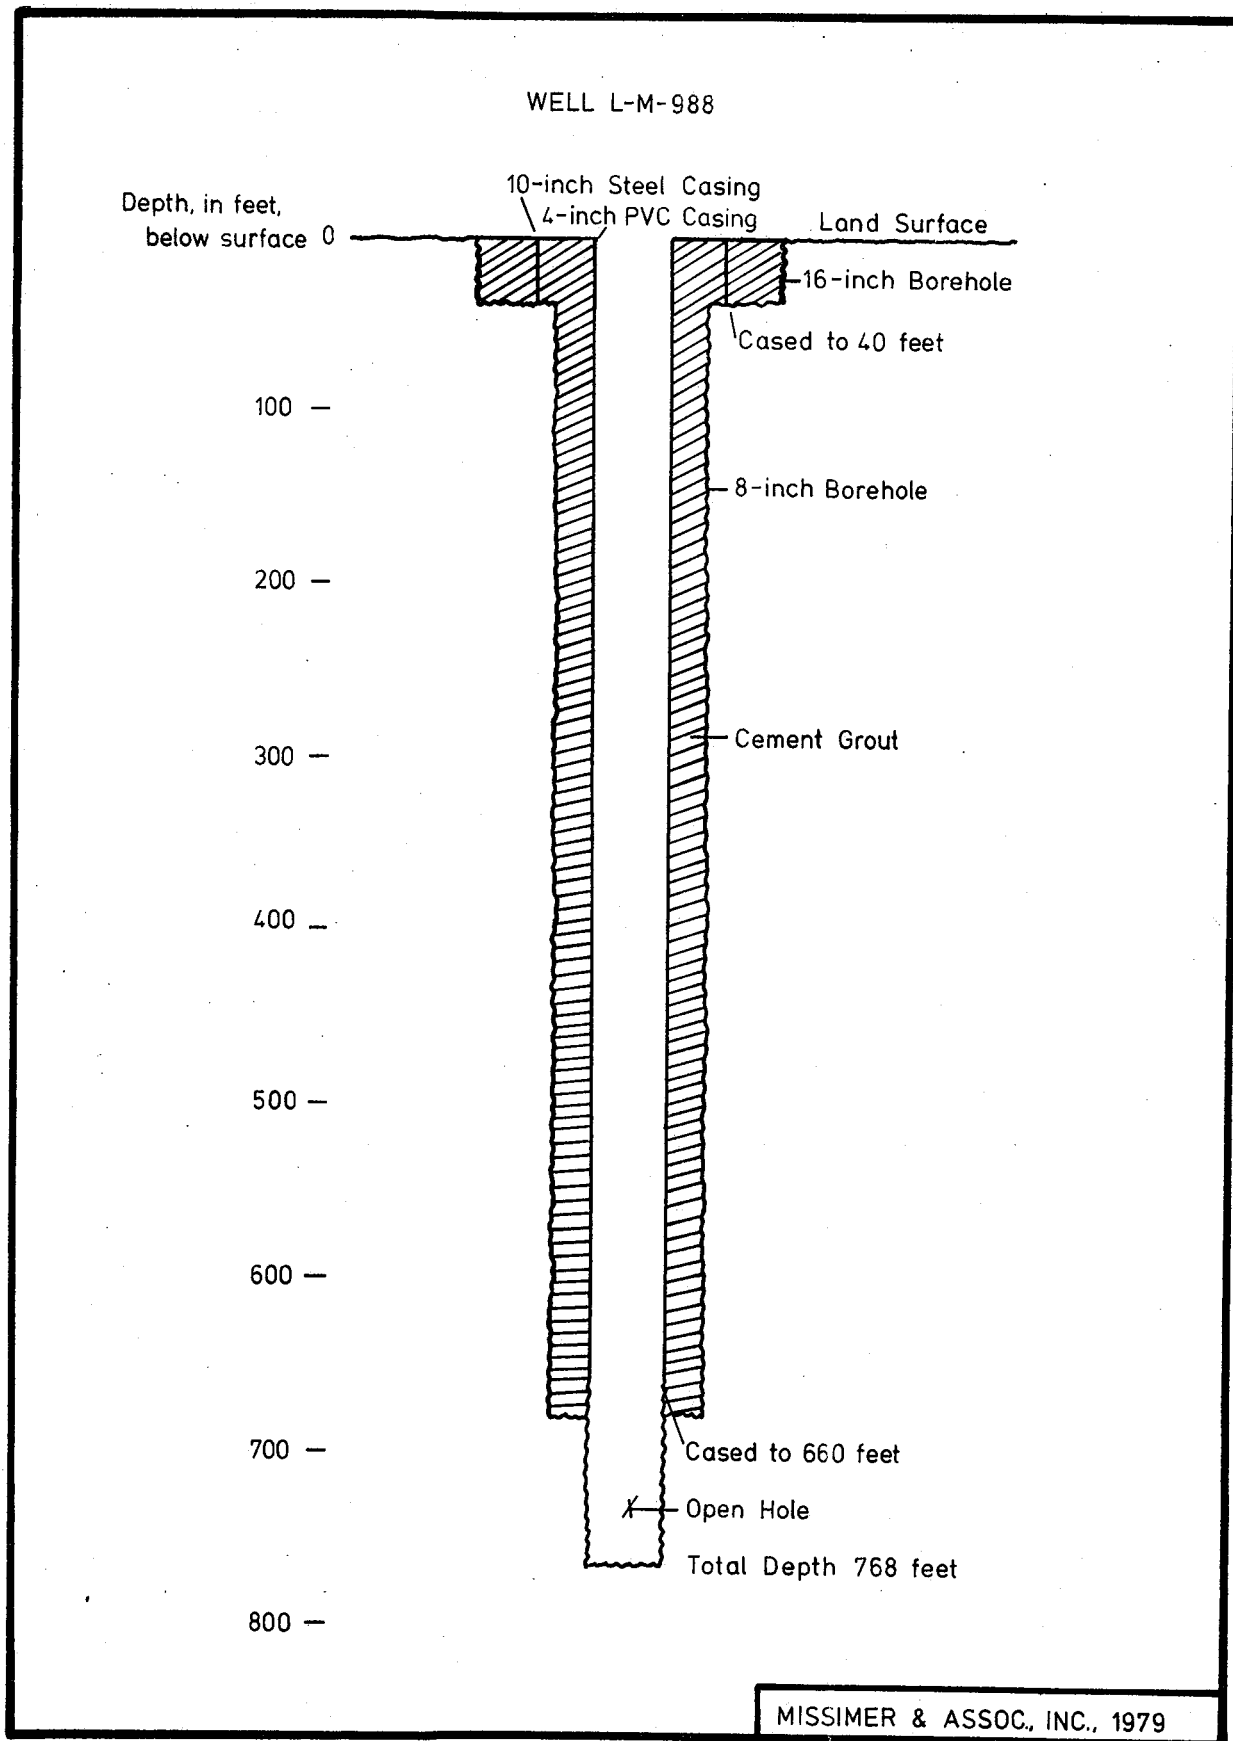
DIAGRAM SHOWING THE CONSTRUCTION DETAILS OF OBSERVATION WELL L-M-988.
